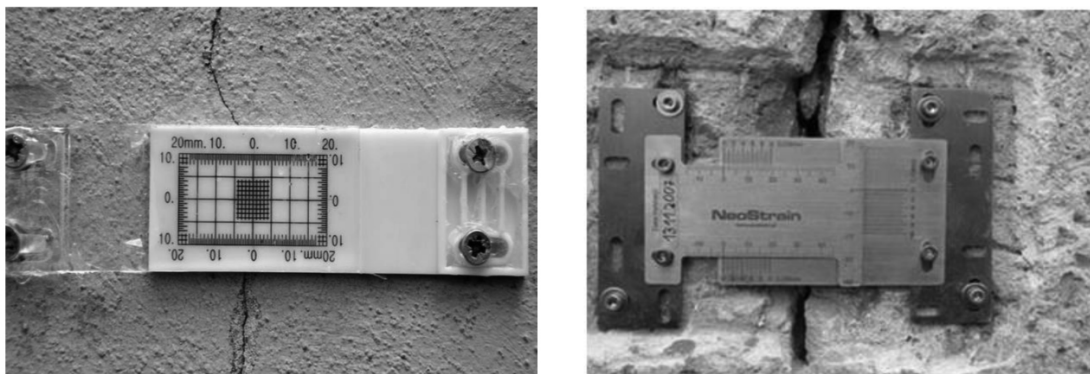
An example of testing plates for monitoring of cracks and fractures of the structure.
